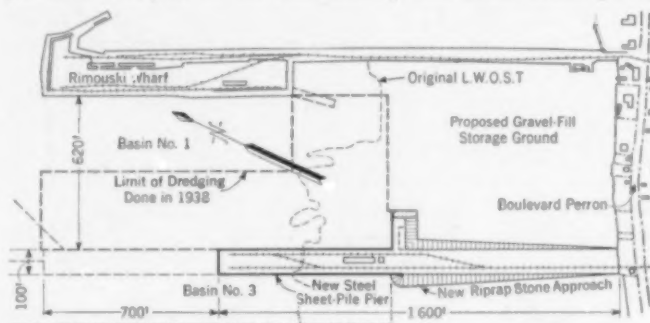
RIMOUSKI HARBOR SHOWING, IN LIGHT LINES, FACILITIES EXISTING IN 1936, AND IN HEAVY LINES, THE NEW IMPROVEMENTS
